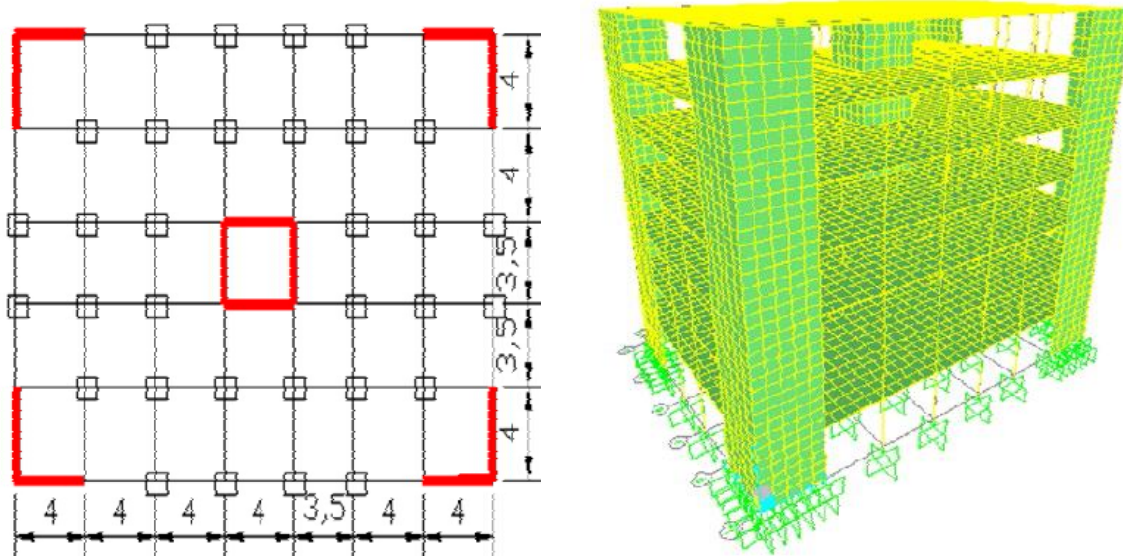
PLAN AND 3D VIEW WITH SHEAR WALL AT CORE AS WELL AS CORNER
